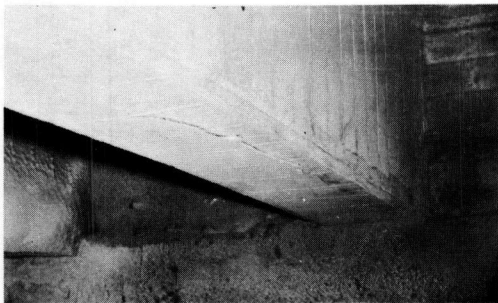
Typical cracks in beam. Note crack in soffit and crack in side of beam in plane of lower reinforcement.
